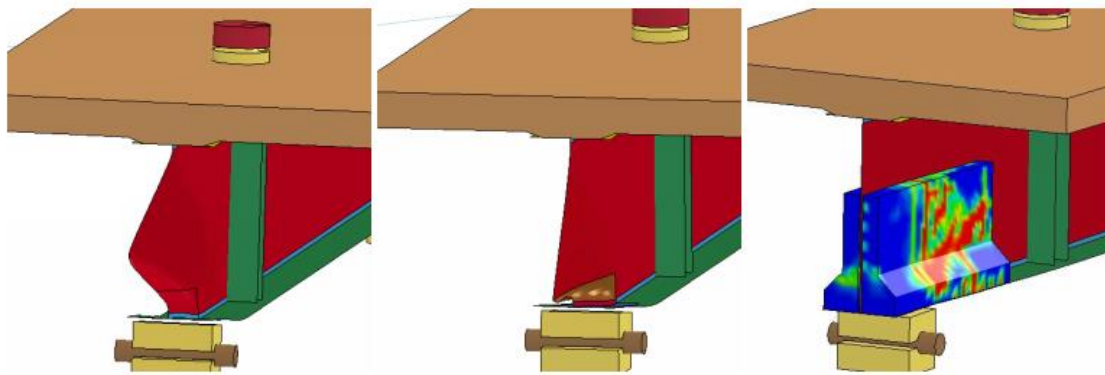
UHPC Repaired Girder Reported by Zmerta et al. (2017)
